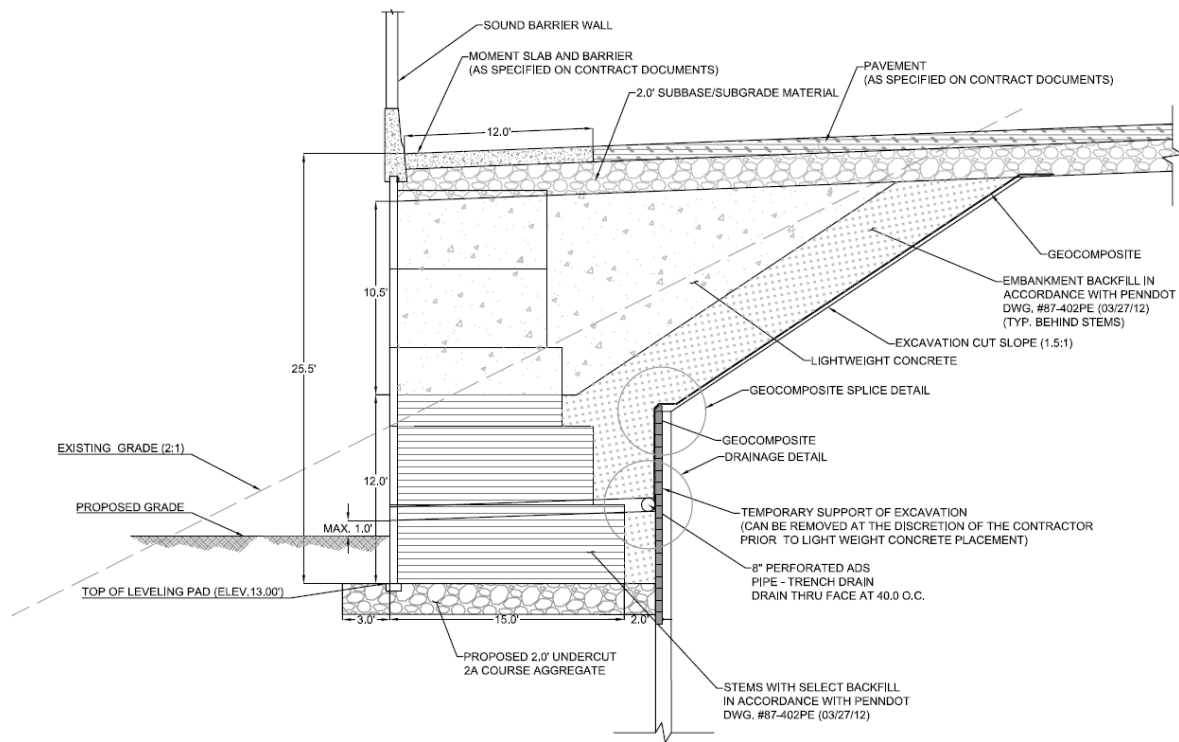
Typical cross section for Wall 10 (S-32599).
